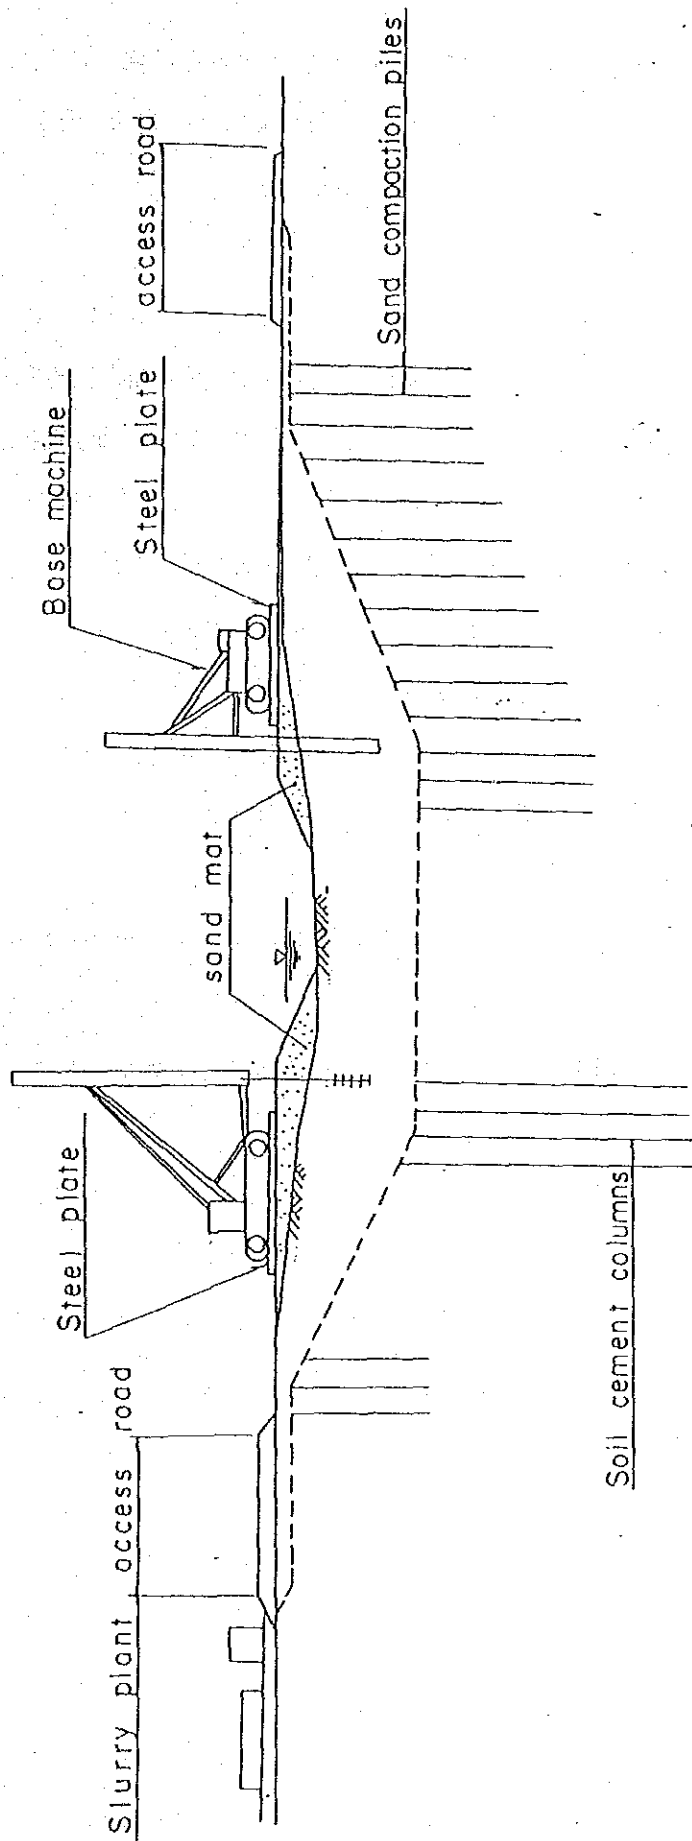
Temporary Work for Foundation Improvement Work
